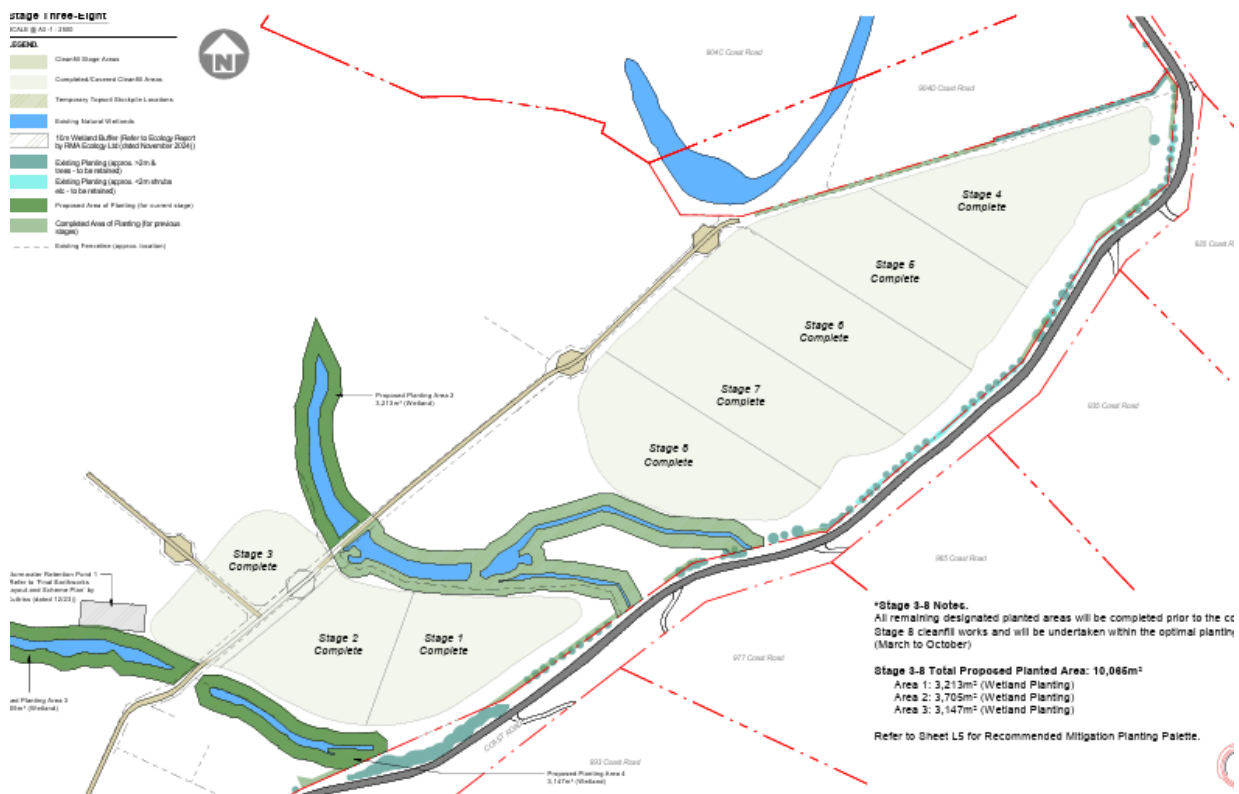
Proposed site plan showing the clean fill once all eight stages are completed.
